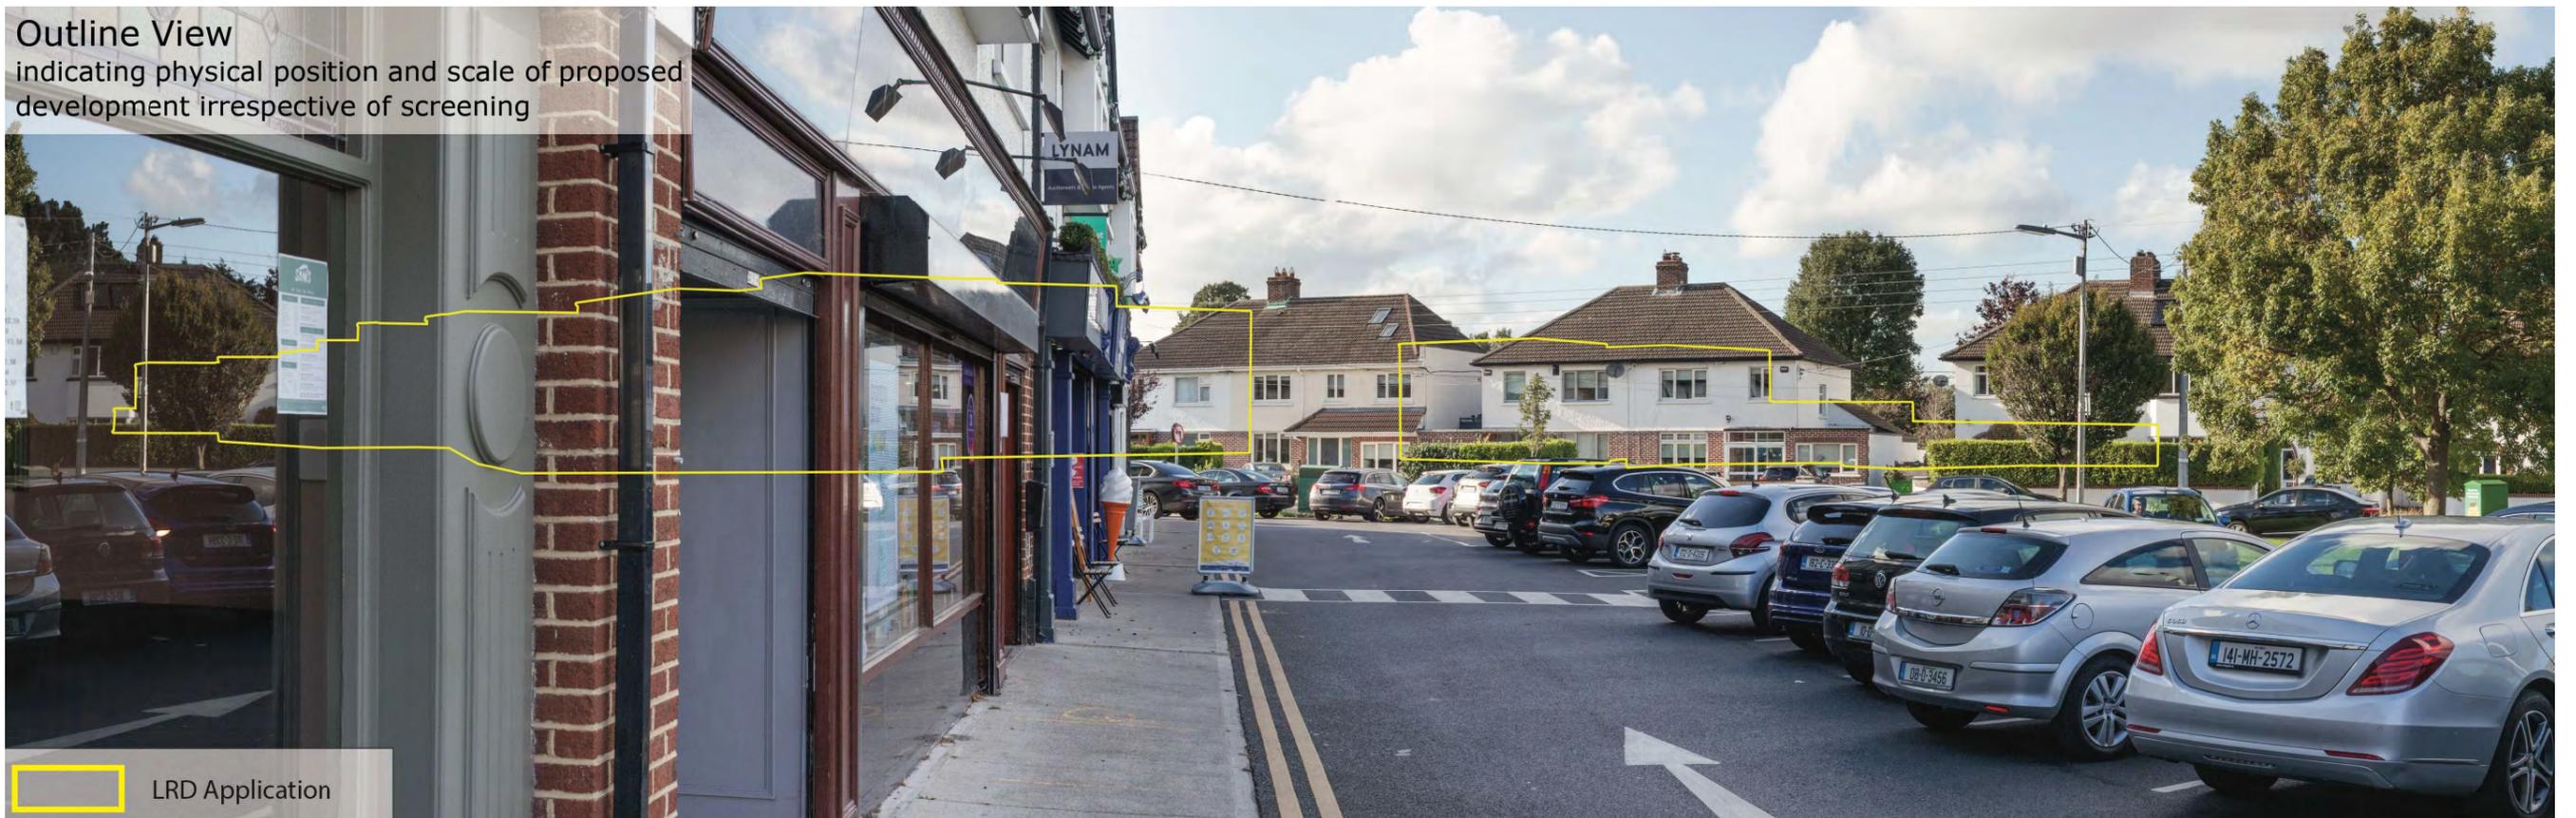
Proposed view towards site from Farmhill Road (VP5)
